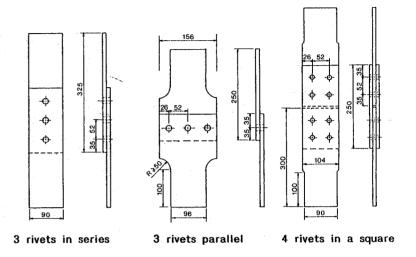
Specimens with 3 and 4 rivets, 6mm plate
